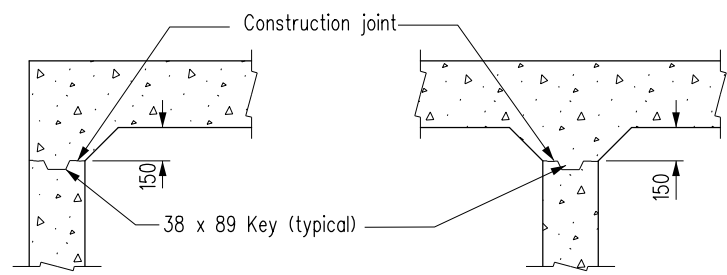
DETAIL DESCRIPTION		CONCRETE DETAILS SECTION B-B & C-C
